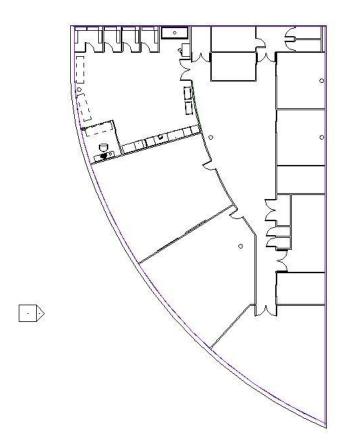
D3 with completed walls, doors, columns and lab equipment.
